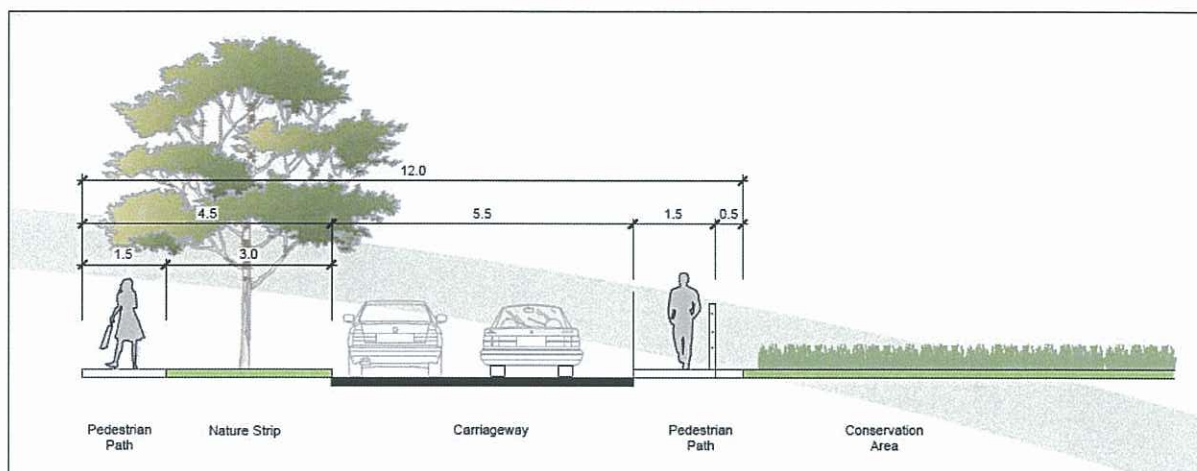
Carriageway Configuration – Access Street 1 Adjacent to Conservation Area
